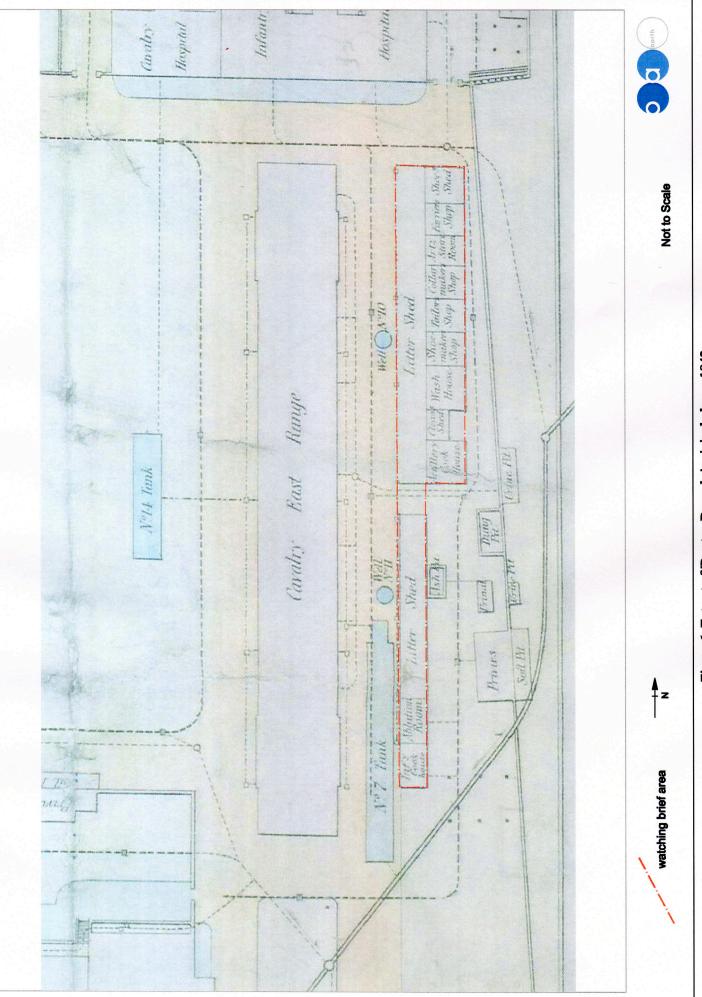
Extract of 'Preston Barracks' original plan, c 1842
